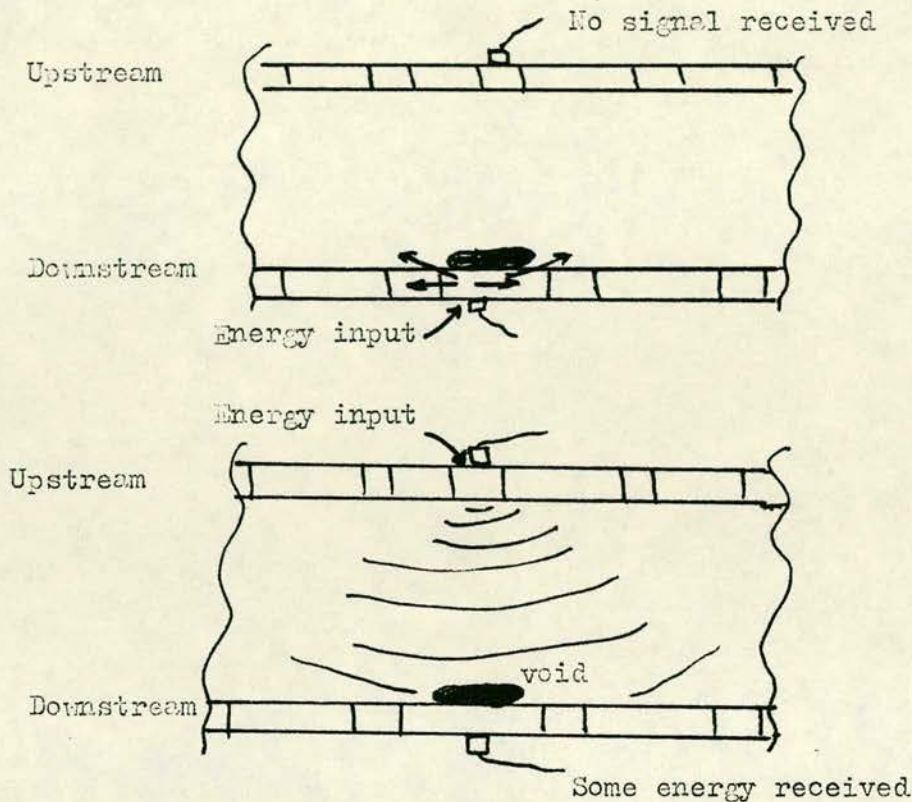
Plan section of the bridge voiding very close to a surface under test
